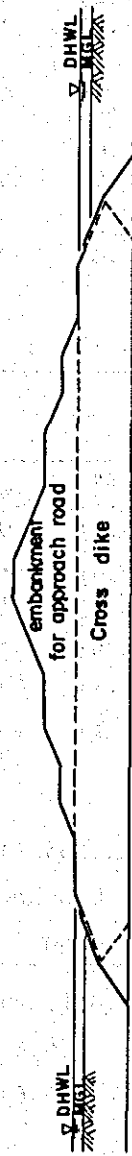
Standard Cross Section of Cross Dike (Scale 1/500)
